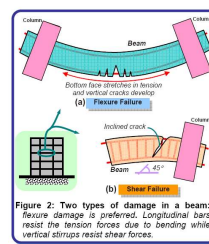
Two types of damage in a beam: flexure damage is preferred. Longitudinal bars resist the tension forces due to bending while vertical stirrups resist shear forces.
